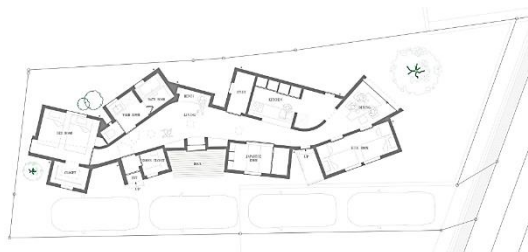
House in Sayo - Fujiwarramuro Architects (<http://www.archdaily.com/345154/house-in-sayo-fujiwarramuro-architects/>); Fig. 333 - Sam's Creek / Bates Masi Architects (<http://www.archdaily.com/325359/sams-creek-bates-masi-architects/>).
